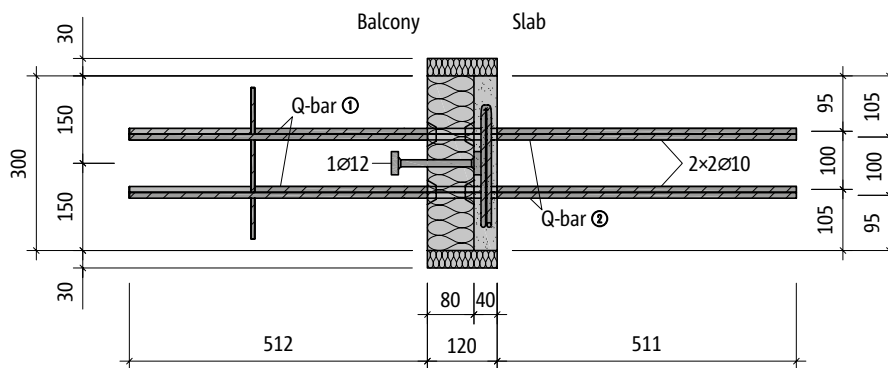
Plan view: Schöck Isokorb® type RQP40+RQP40
